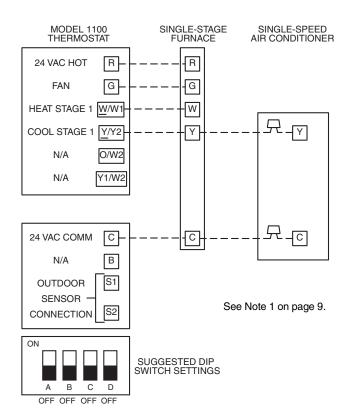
Single-Speed Air Conditioner with Single-Stage Furnace — Model 1100 Thermostat
